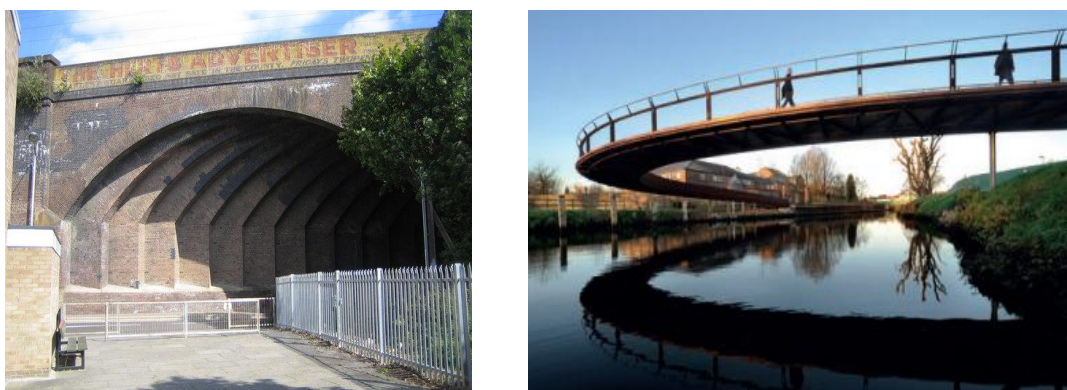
Southdown Road Skew Bridge and Jarrold Bridge
